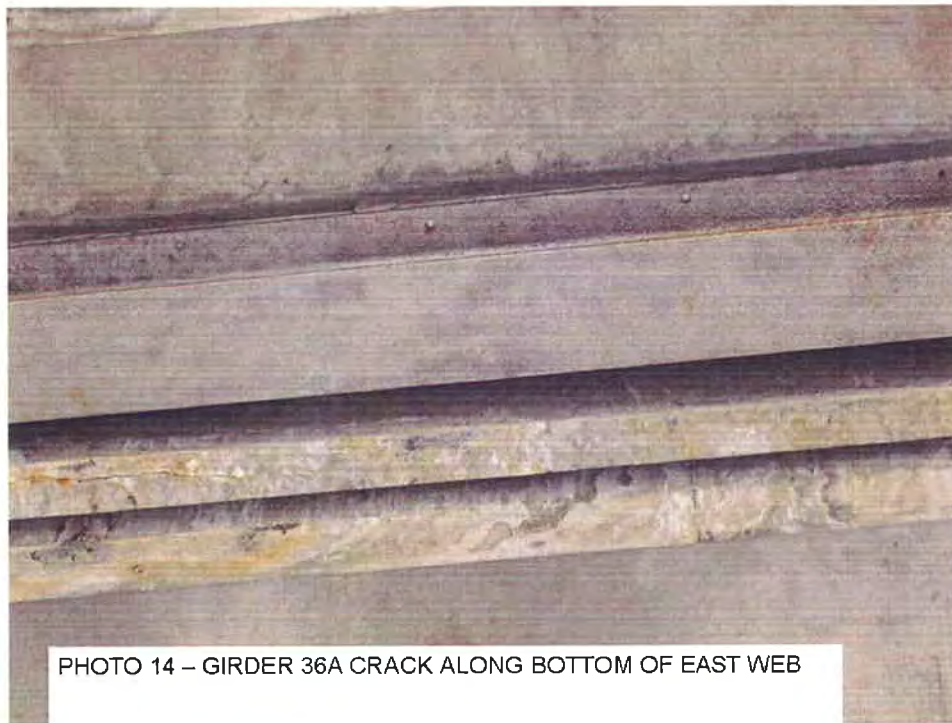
GIRDER 36A CRACK ALONG BOTTOM OF EAST WEB
